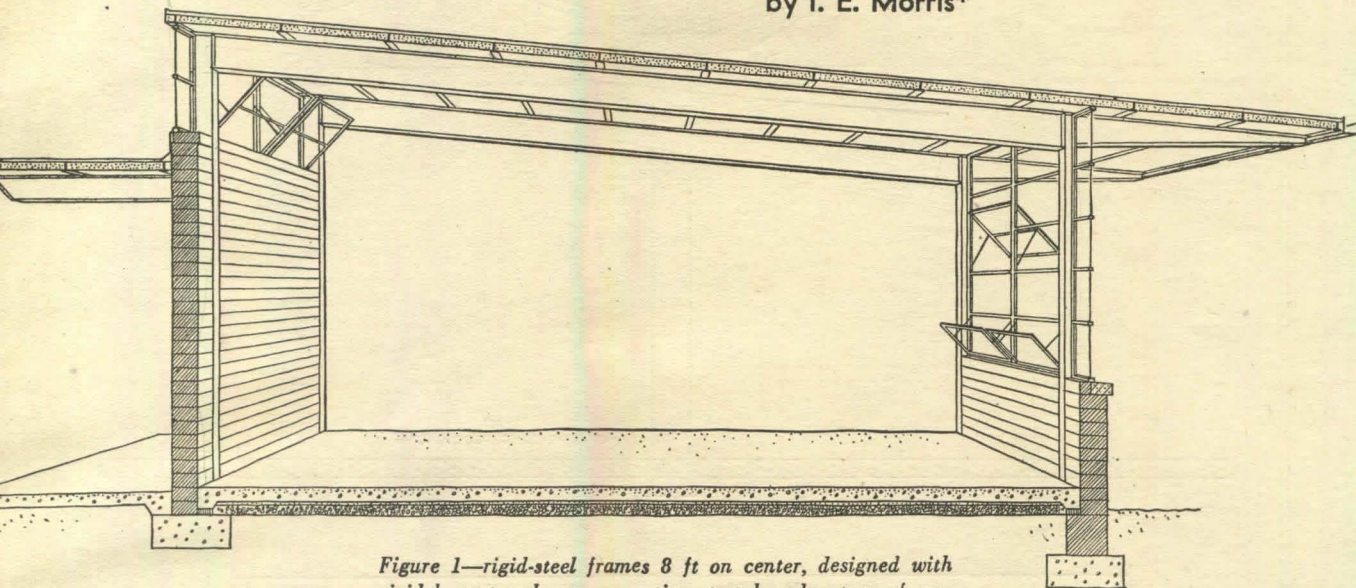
rigid-steel frames 8 ft on center, designed with rigid beam-to-column connections to take advantage of continuity, are suitable for most types of roof decking.
